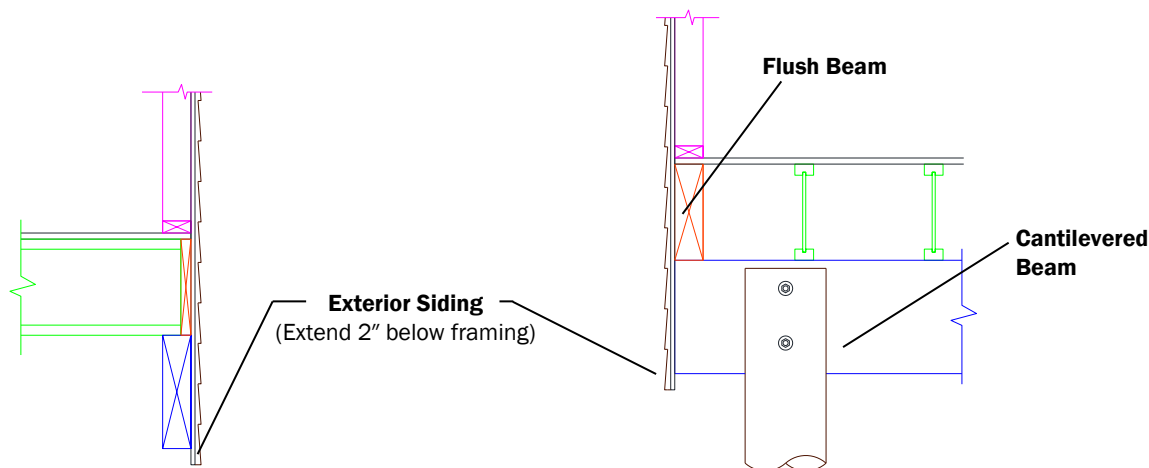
Joist to Beam Connection Detail (Cantilever Condition).
